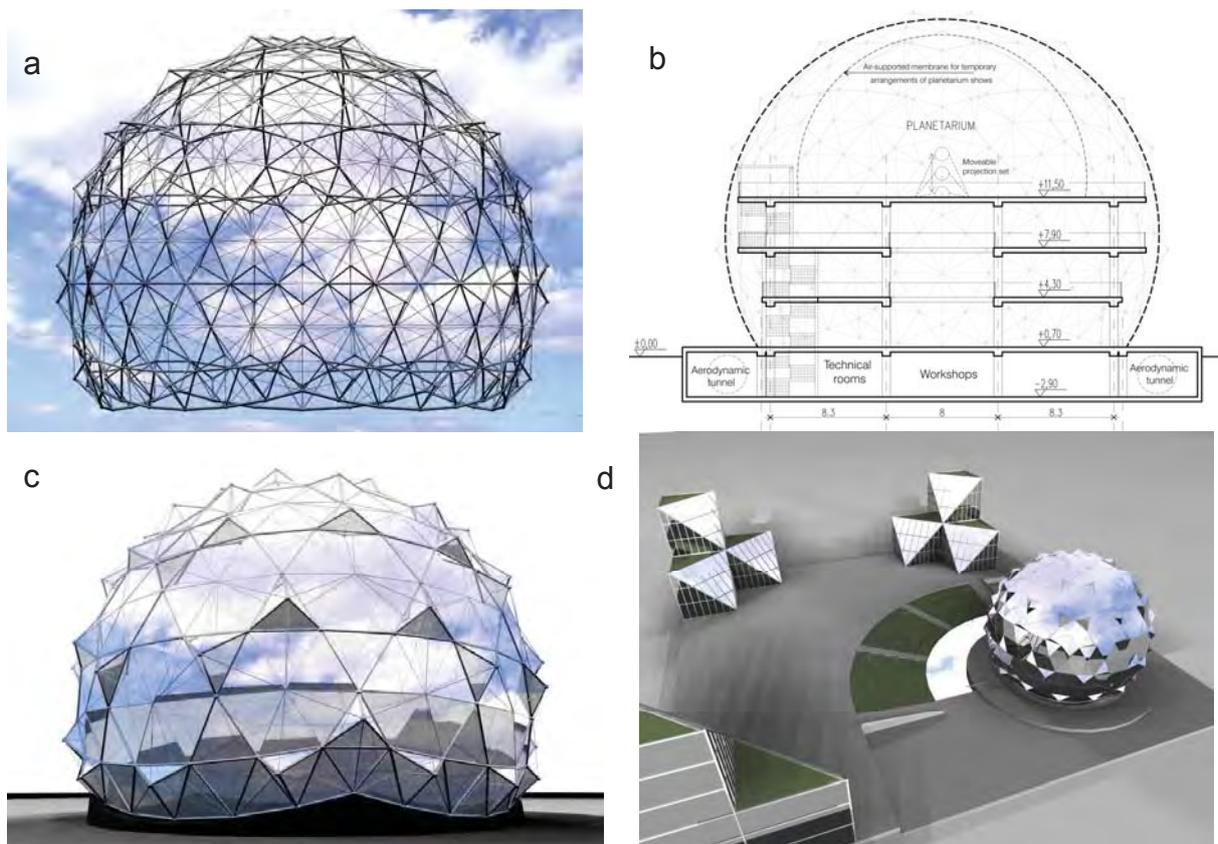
a) View of the VA(TH)No2 tension-strut structure, b) vertical cross-section of the main pavilion of the Geo Centre, c) view of the structure with the glass panels cladding, d) bird view of the whole Geo Centre
